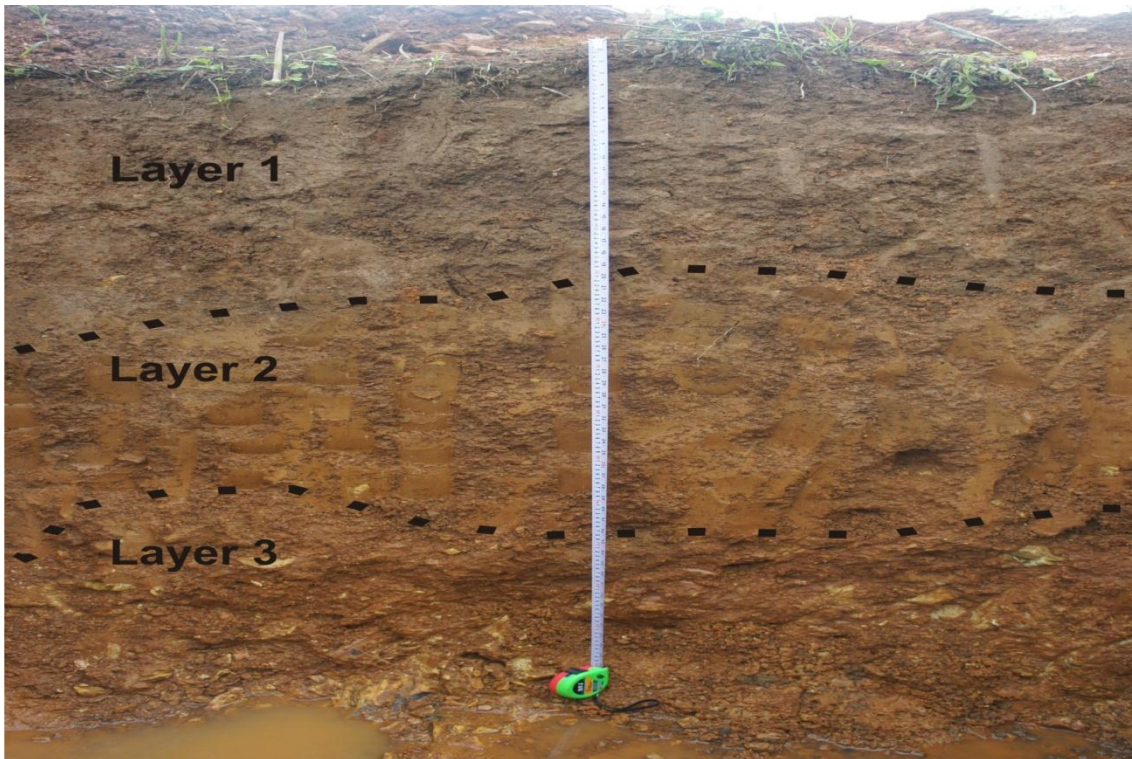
Pit hole dug for geotechnical investigations, pit no. 1 (for detail description of pit profile see section 4.2).
